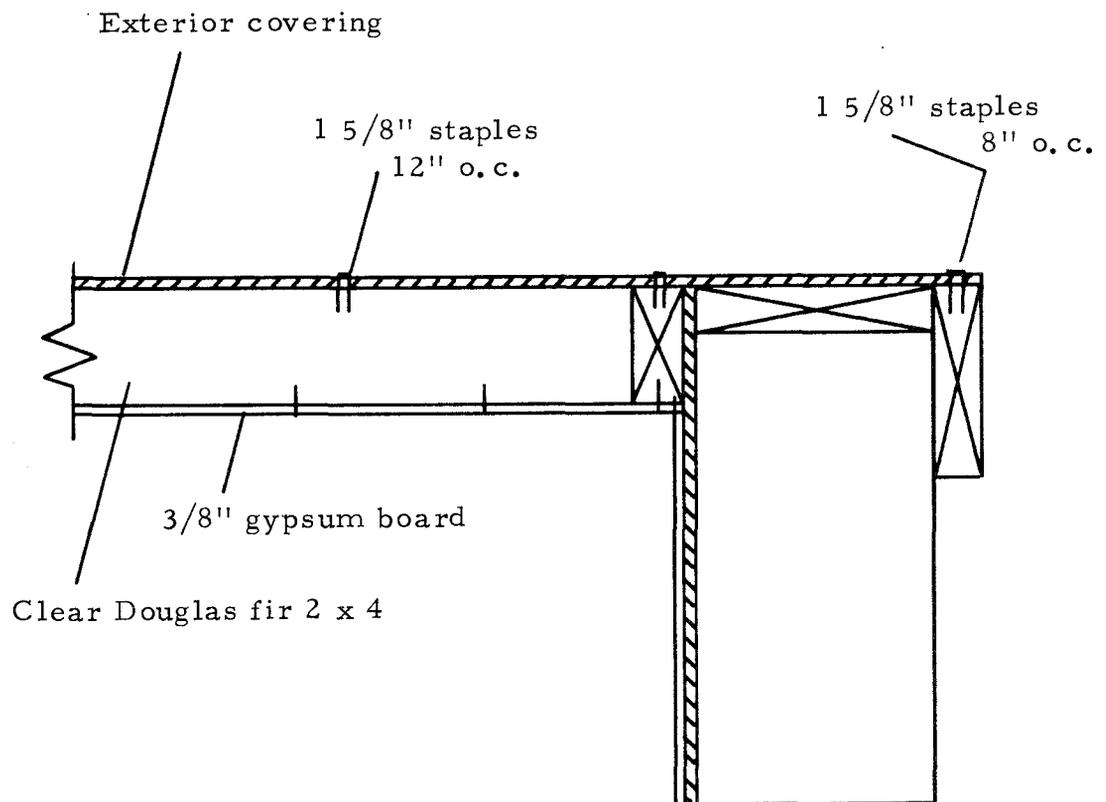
Wall construction type IV which has exterior covering attached with staples.
